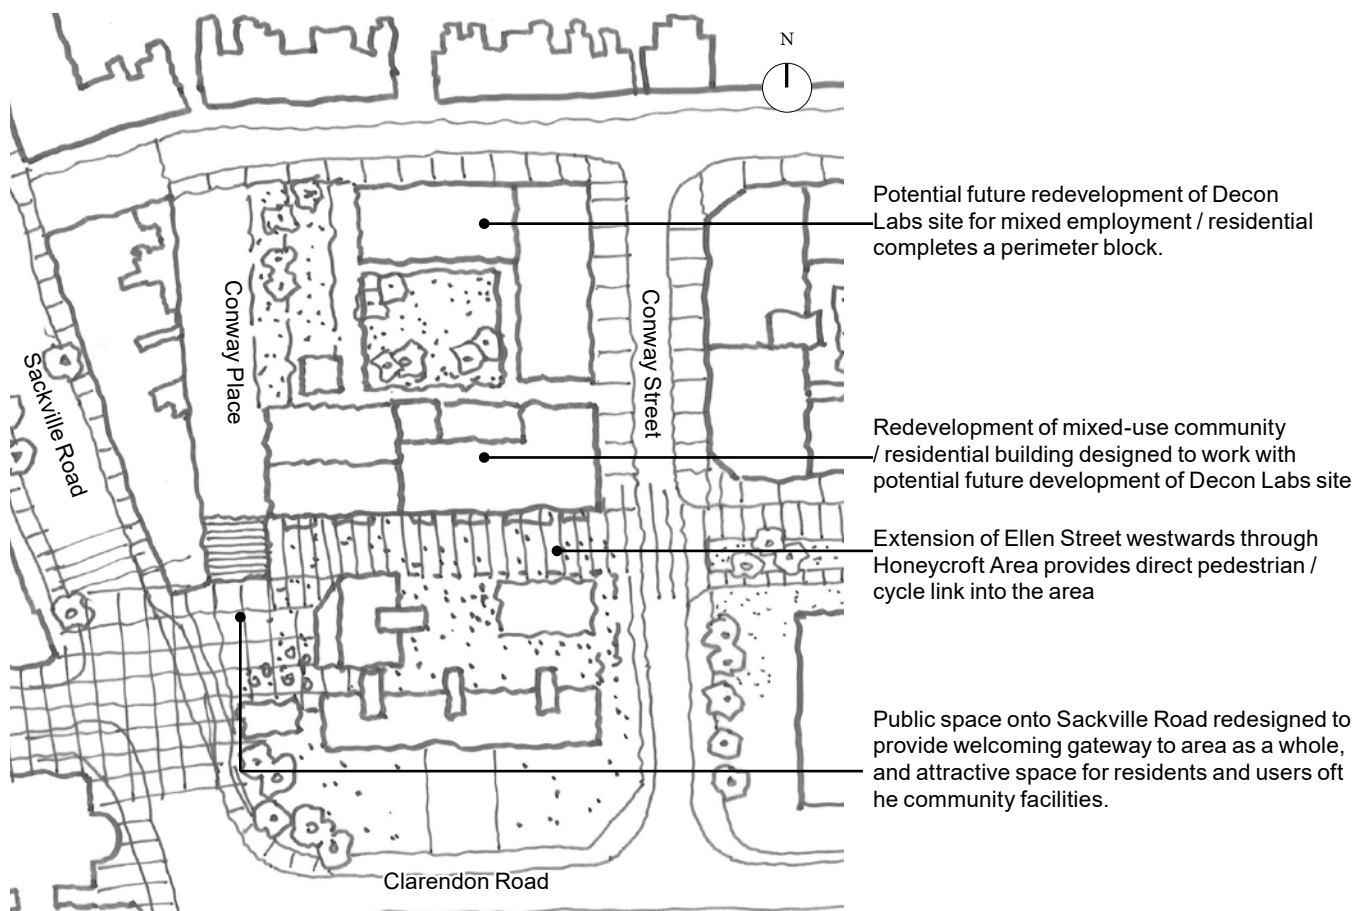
Illustrative plan view of the Honeycroft Centre Area.
